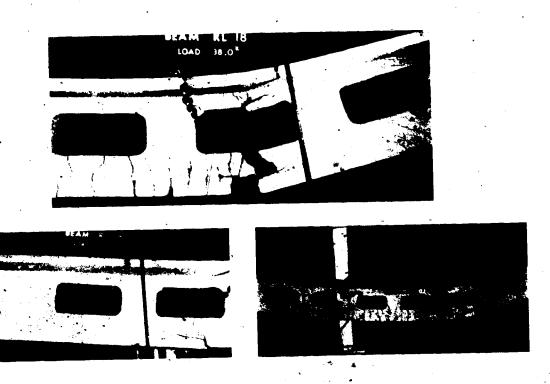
CRACKING AND FAILURE PATTERN OF BEAM 18-16-4
